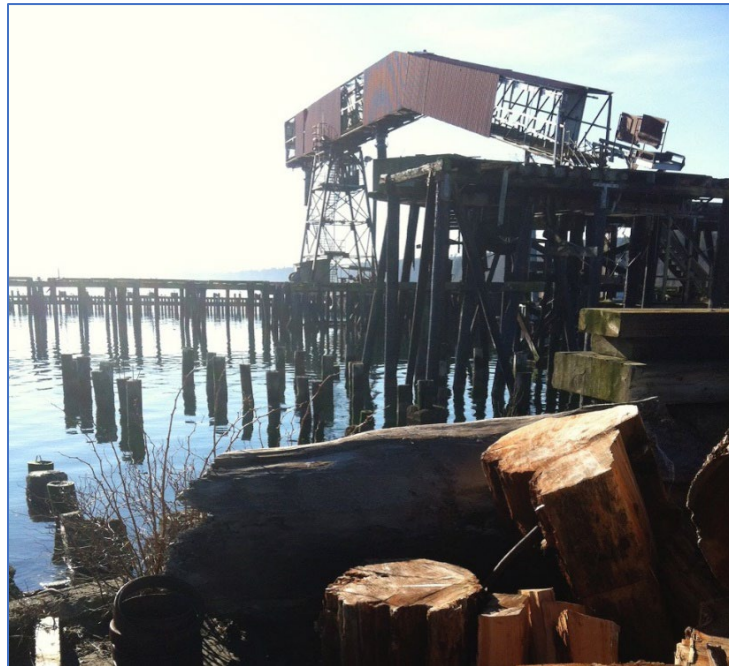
Former Mill Site in 2012 prior to removal of over-water structures and pilings. Photo credit: M. Carlson, USFWS
